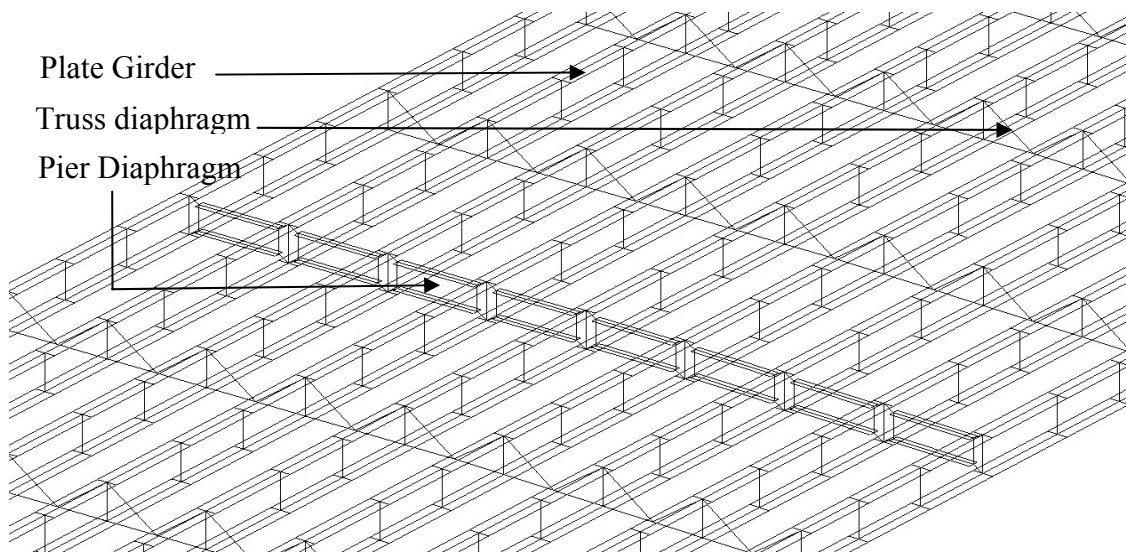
Girders and diaphragms as defined geometrically in the finite element model.
